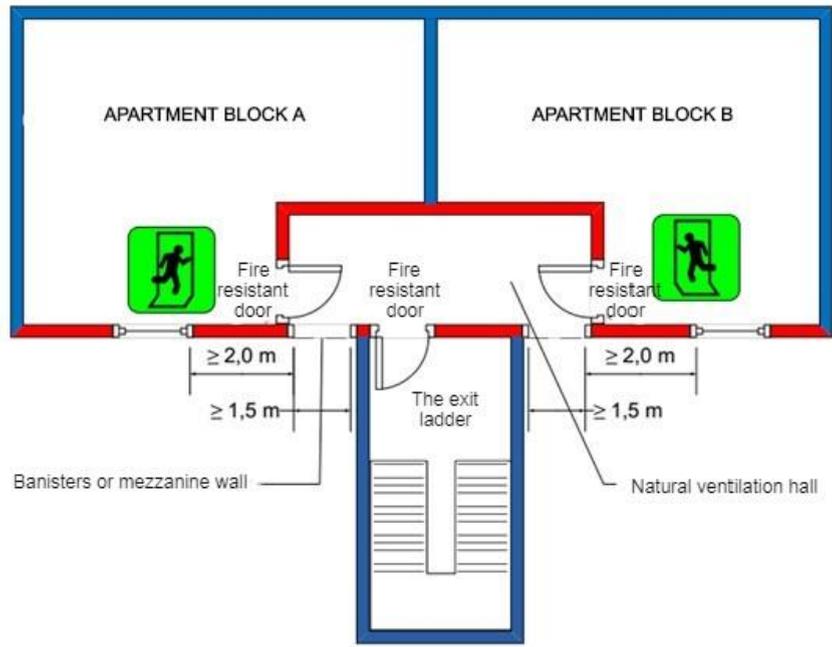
Layout of type N1 staircase (see 3.4.10a))
